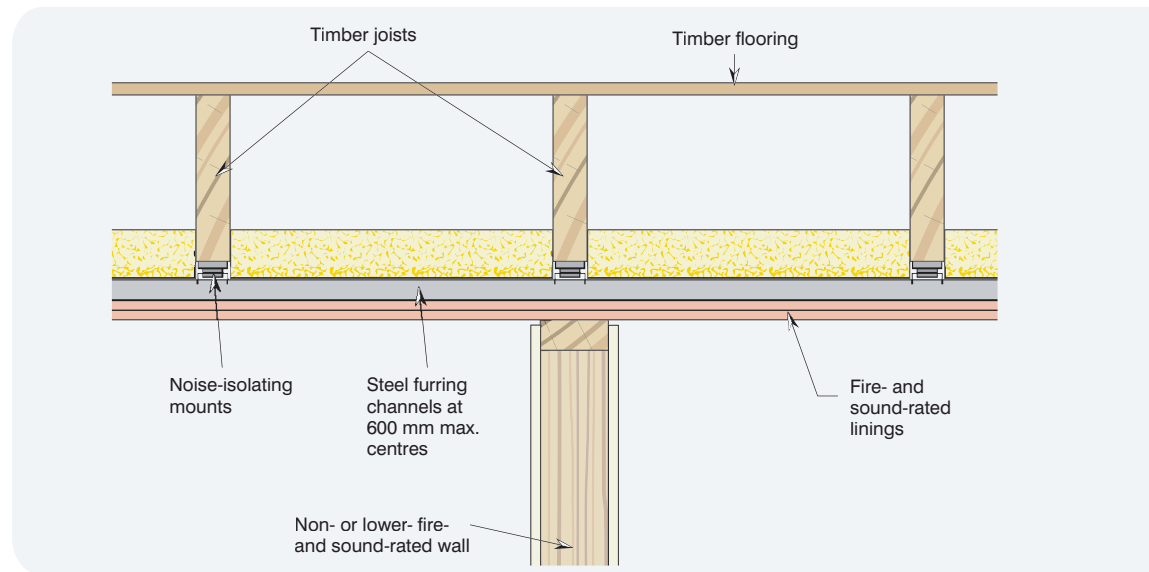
Internal non-rated wall intersecting a fire-rated floor/ceiling systems.
